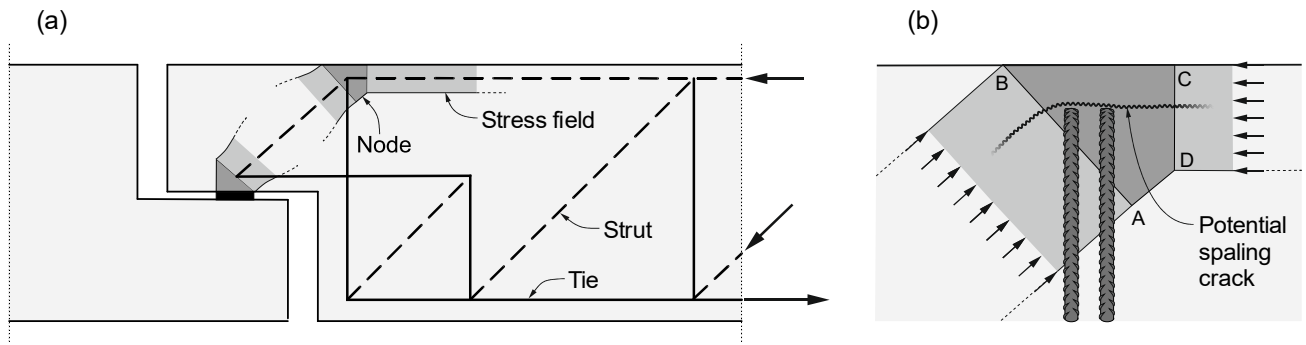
Dapped-end beams: (a) typical geometry with strut-and-tie model for orthogonal reinforcement and (b) detail of the nodal area on top of the hanger reinforcement.
